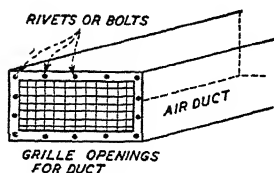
Grille Air Duct Opening Installed on Air Duct
